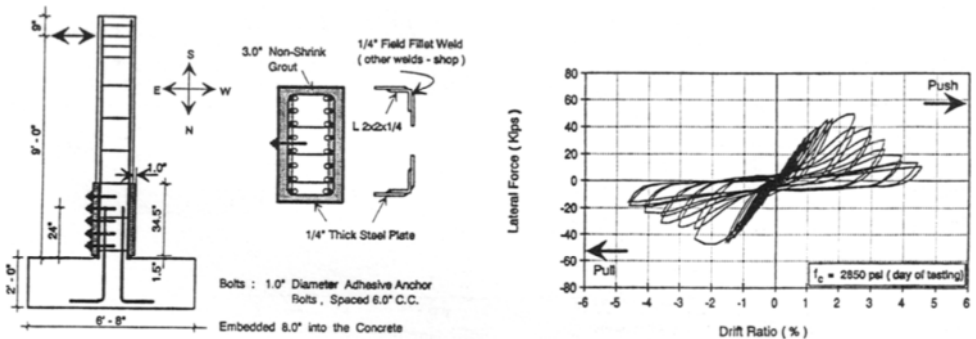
Column with inadequate splice--Repaired with cover removed and steel jacket added
